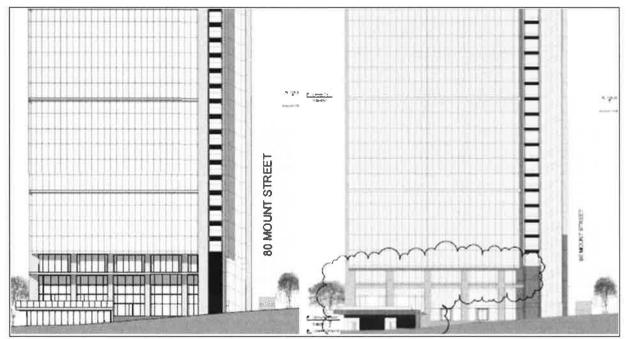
Approved (left) and proposed (right) external alterations to the northern, Spring Street, elevation (source: Proponent (MOD 4 and MOD 5))
